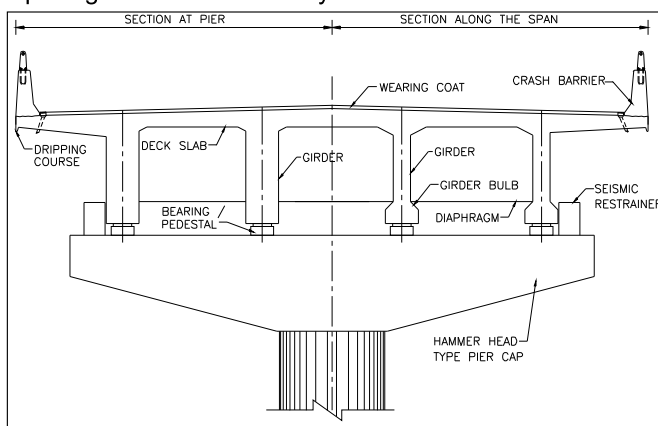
Schematic Cross Section of RCC T-beam & Slab Super-Structure System
